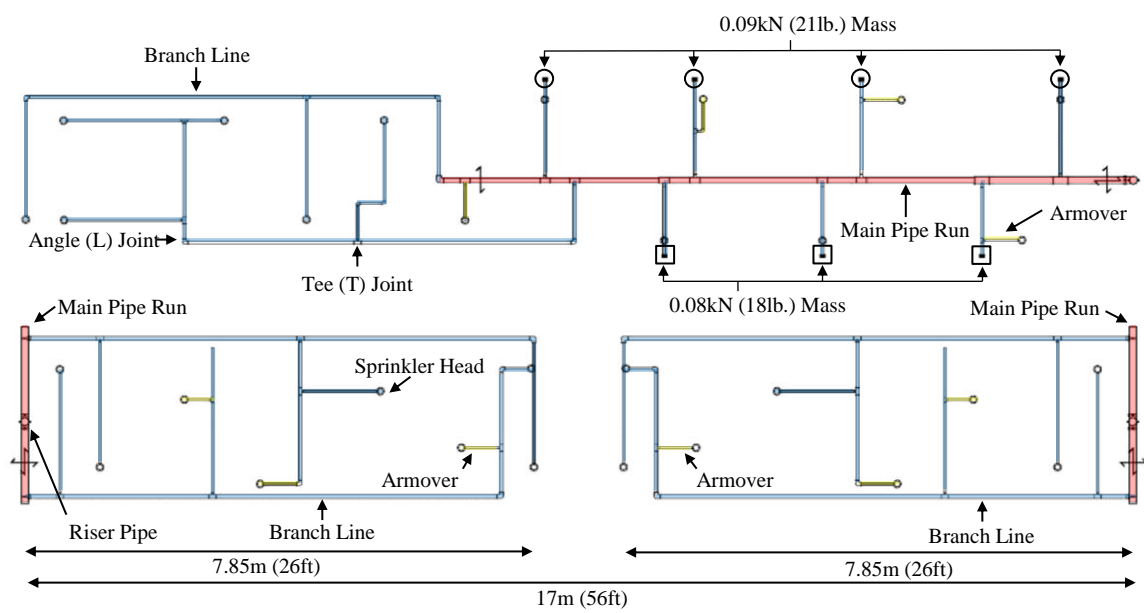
Plan View of Piping Configurations: (top) continuous, (bottom) separate
